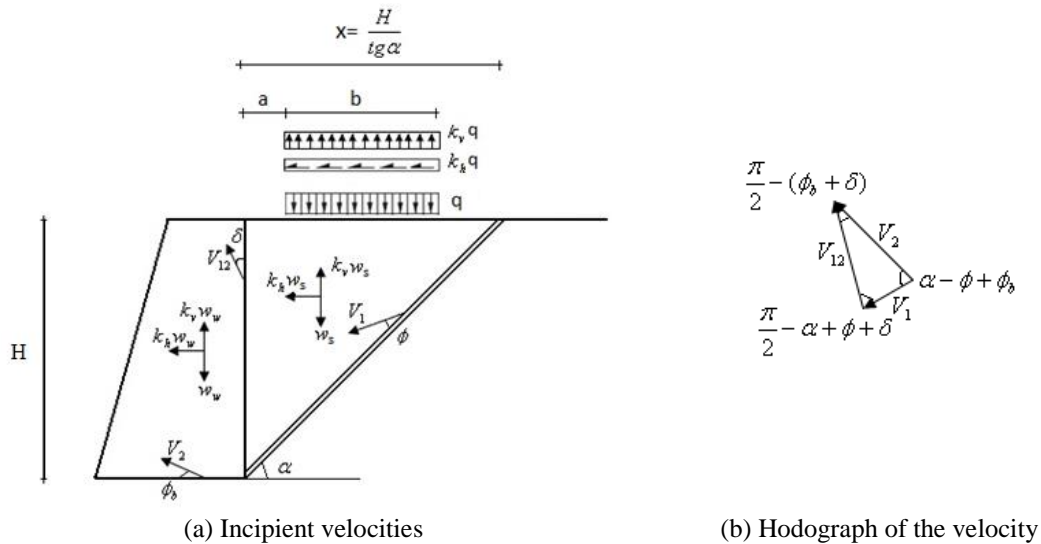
Initial single-block failure mechanism for the first case (surcharge completely inside the failure wedge)
